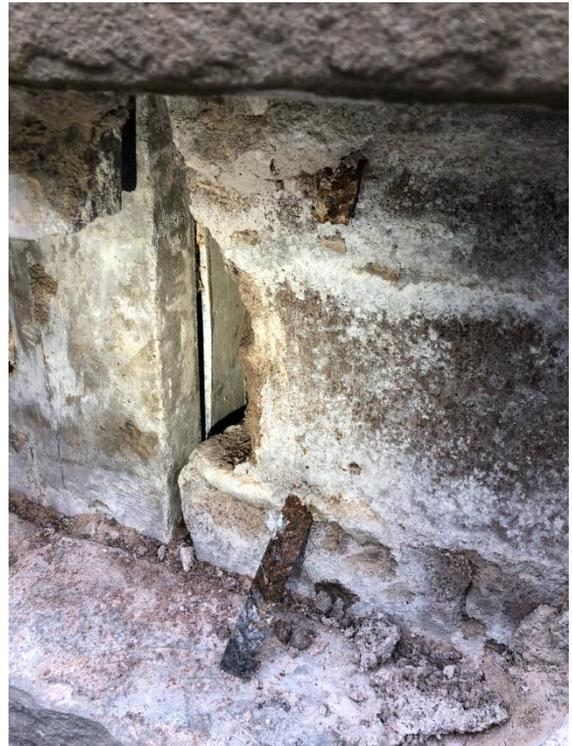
Opening 5 – Mortar filled cavity. Corroded strip tie visible. Dovetail slot in column face.
